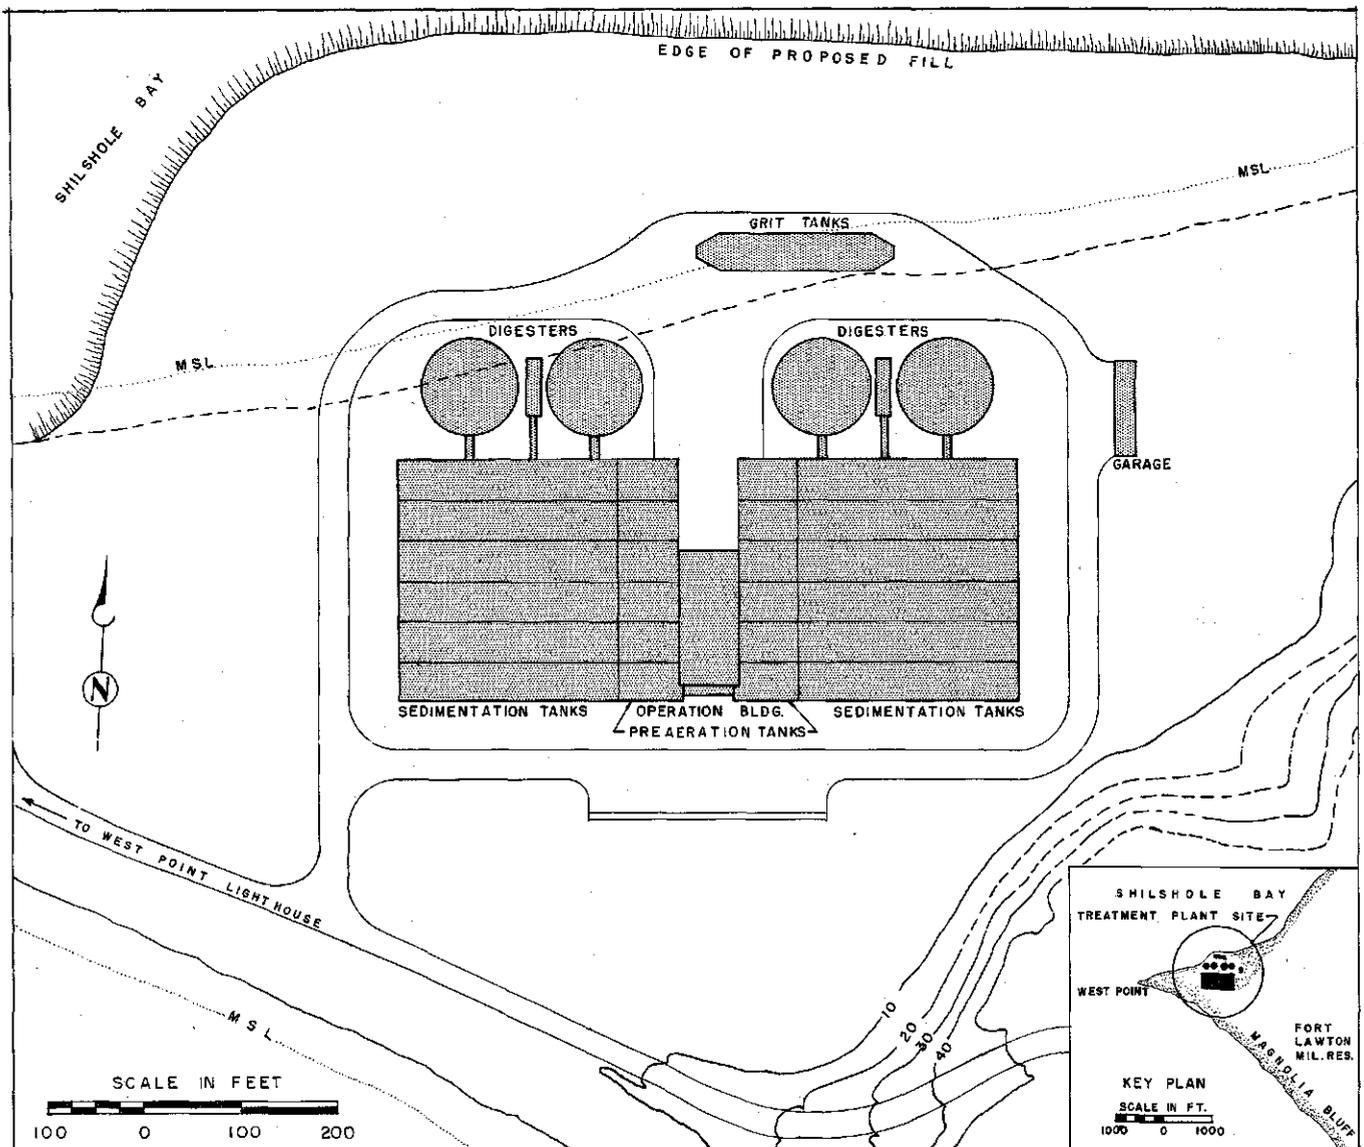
Suggested Layout of Sewage Treatment Facilities, West Point Plant
